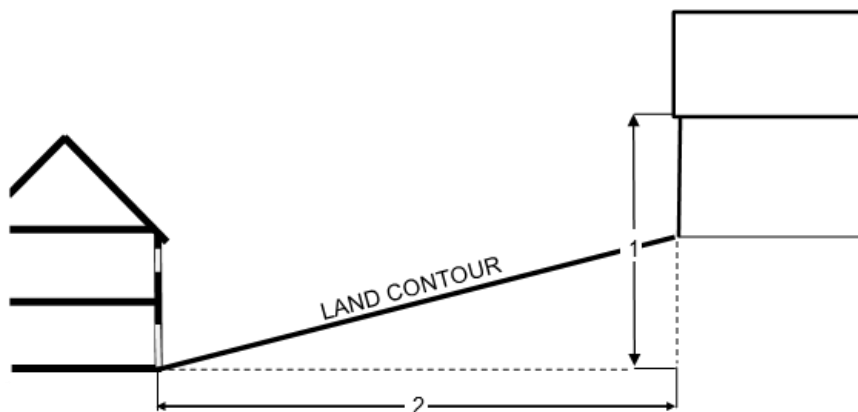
The distance between habitable room windows and an elevated blank wall must be a minimum of twice the height of the wall plus the level difference.
